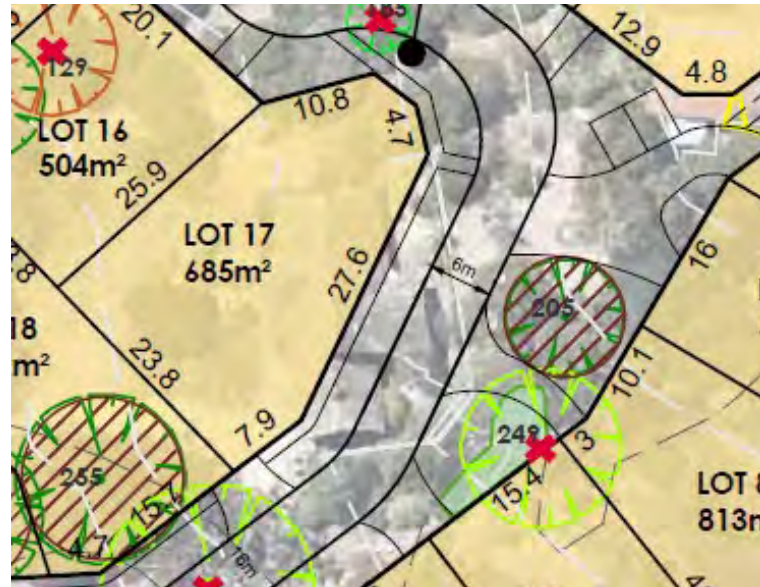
Examples of shifting/widening road reserve to meander around existing trees (photo sourced from www.nearmap.com.au)
